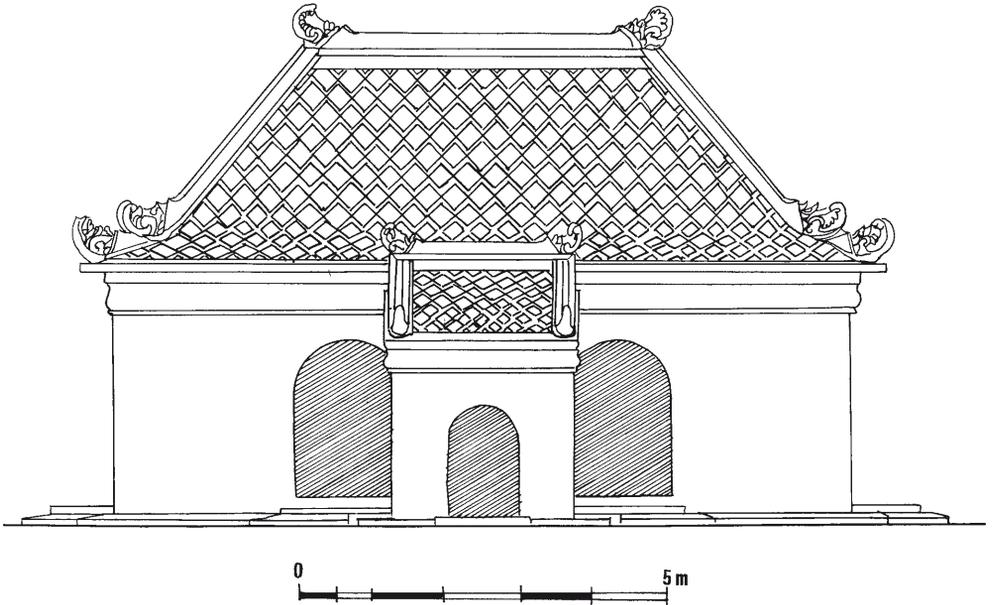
Yogyakarta, Taman Sari, elevation of pavilion 14.
